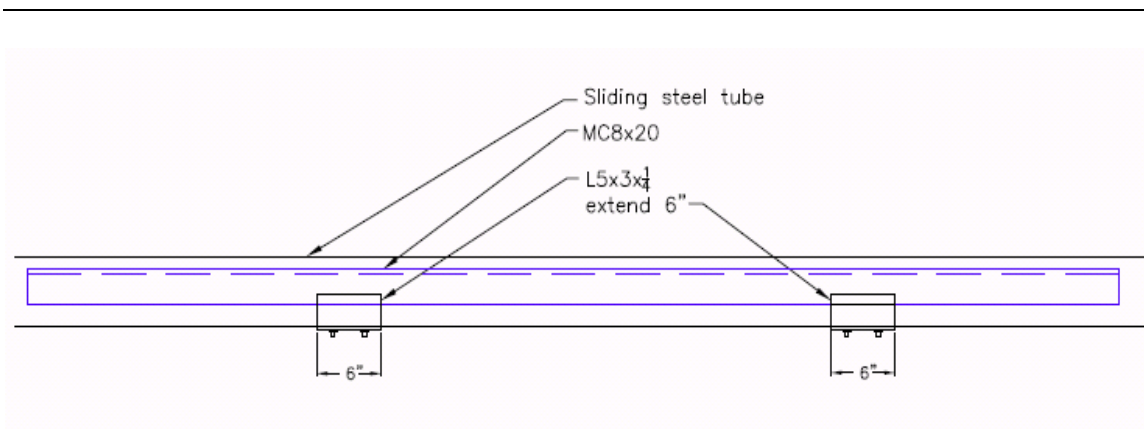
Out-of-plane bracing attached along sliding steel tube of racking facility
